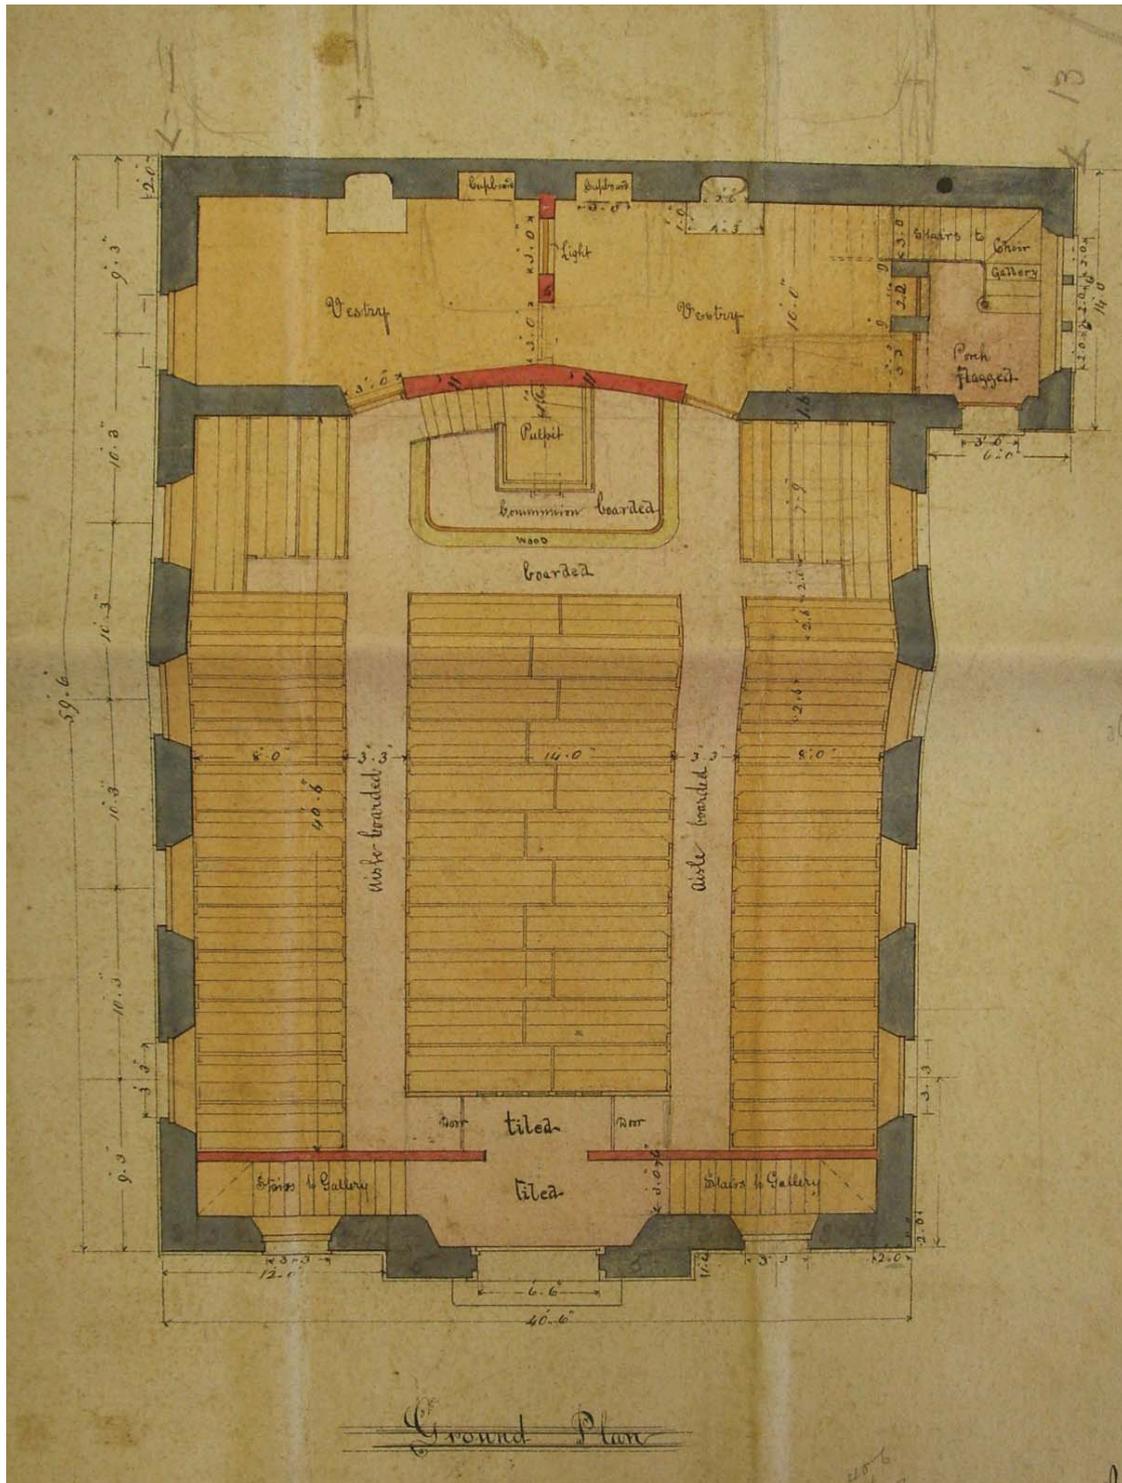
Ground floor plan as proposed in original drawings of 1872 (CRO(B) Z1099 1872)
